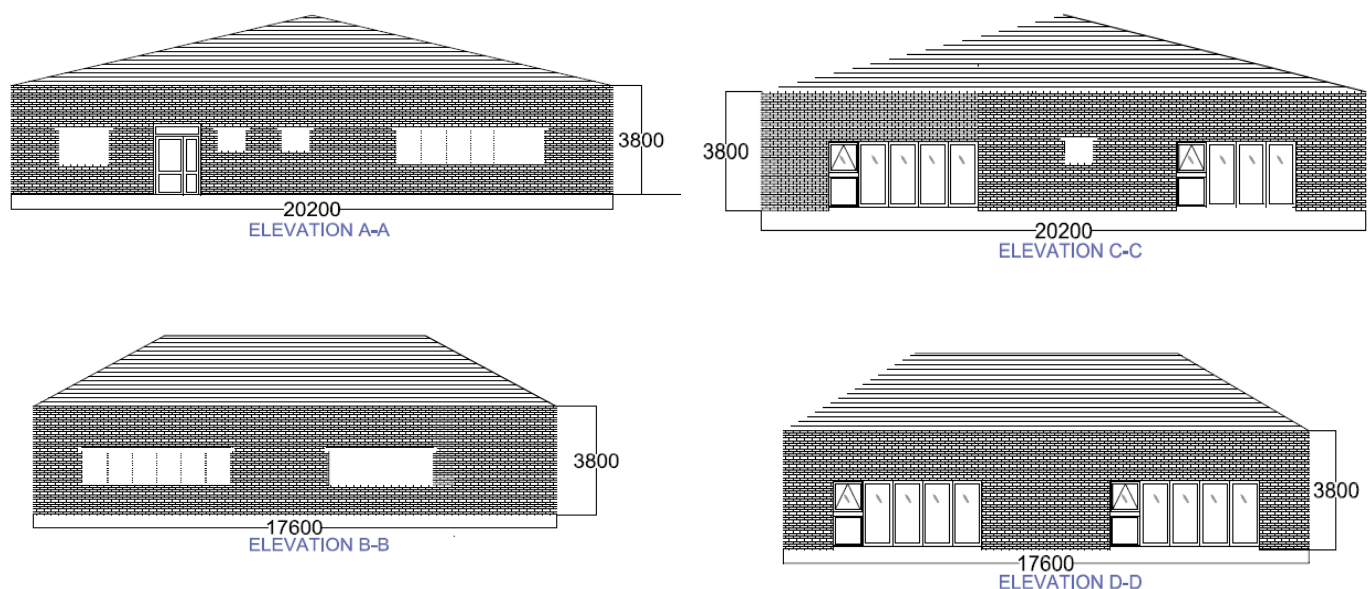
Proposed front (east) and side (south) elevations (left). Proposed rear (west) and side (north) elevations (right).
